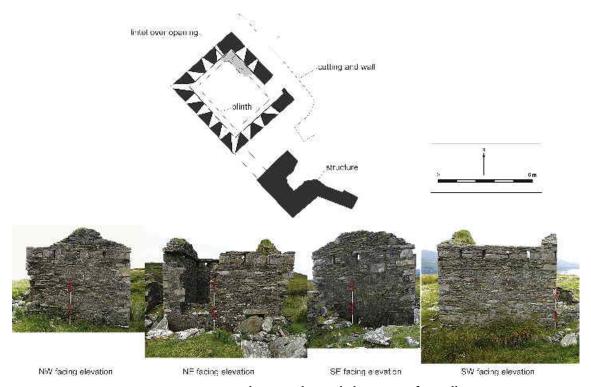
Battery No. 4 showing plan and elevations of guardhouse
